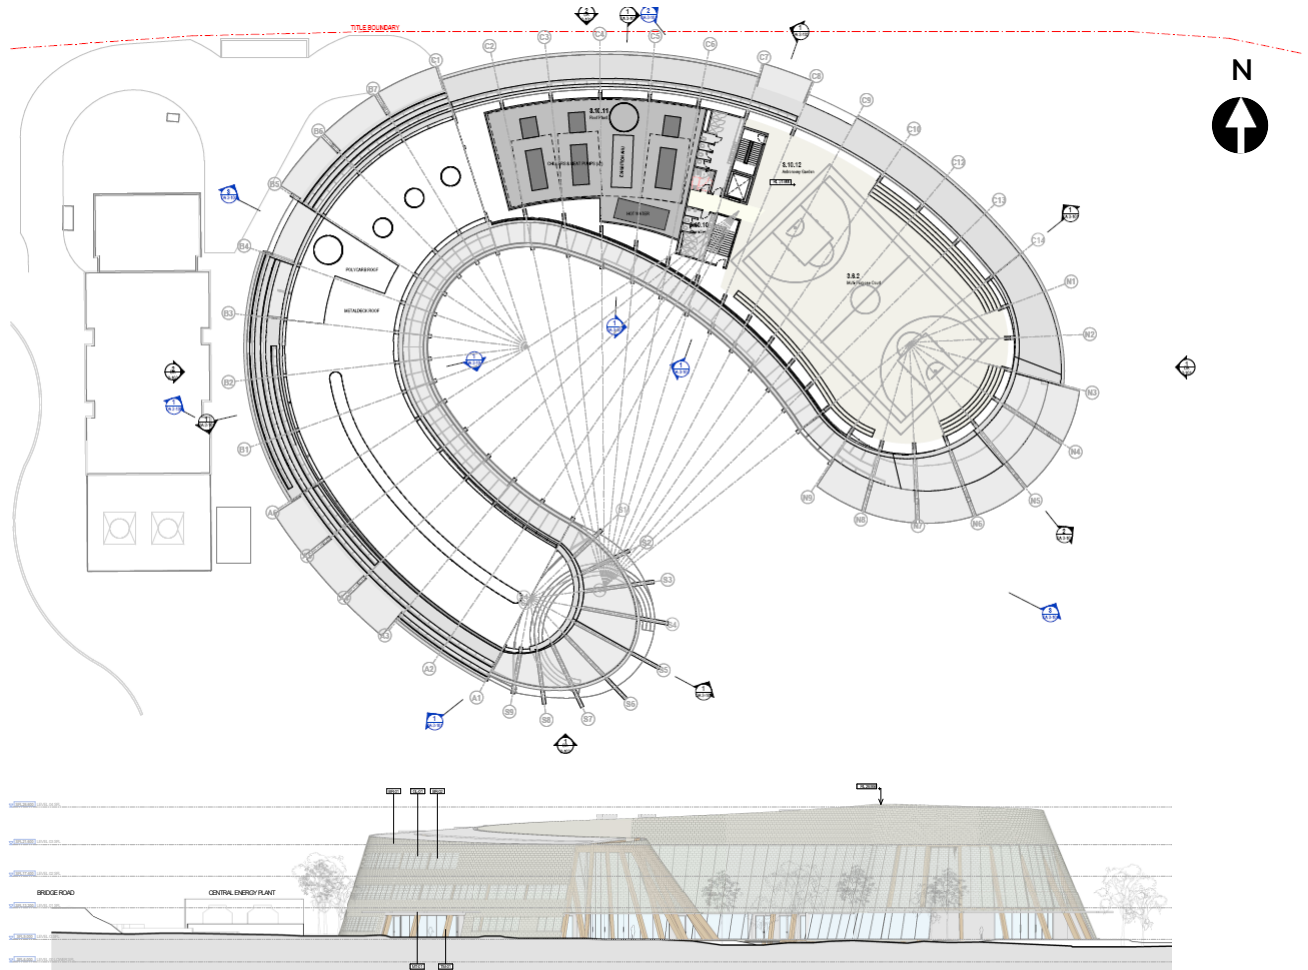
Level 3 plan (top) and South Elevation (bottom) of proposed development
